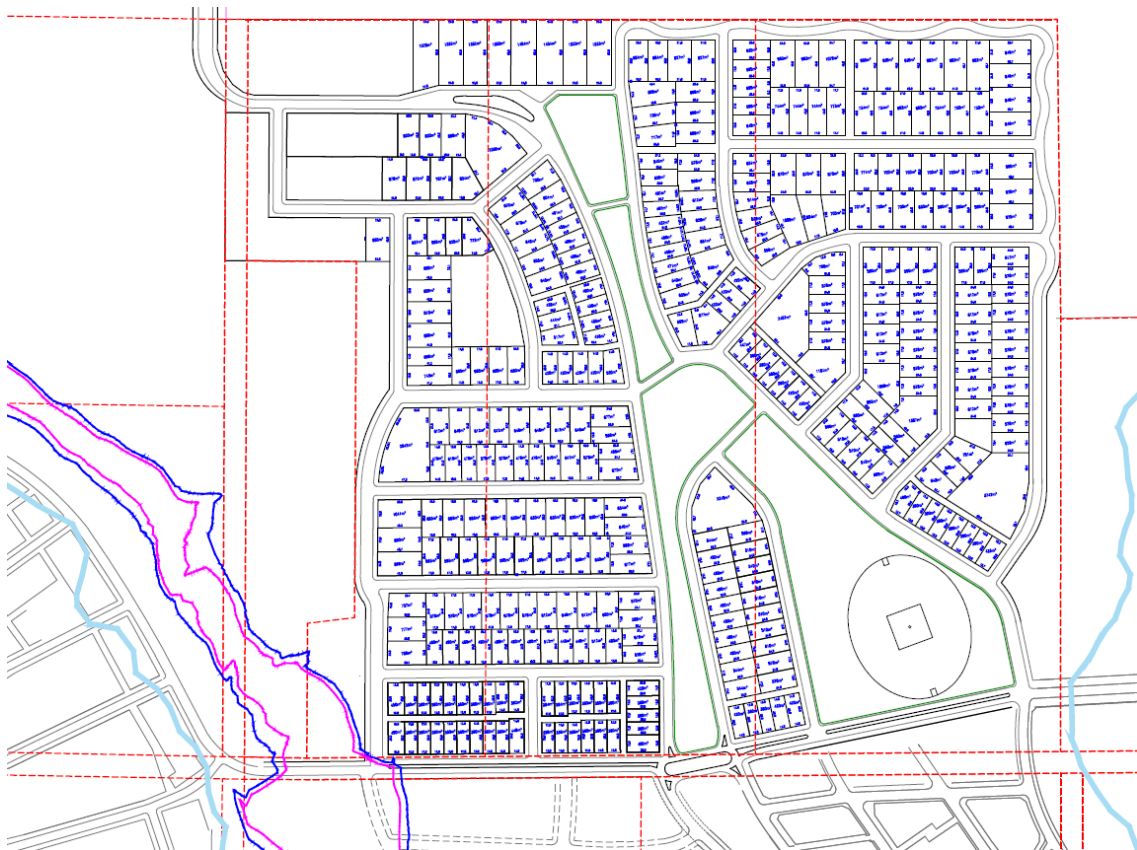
Proposed subdivision layout plan, Sub-stage 2-5
